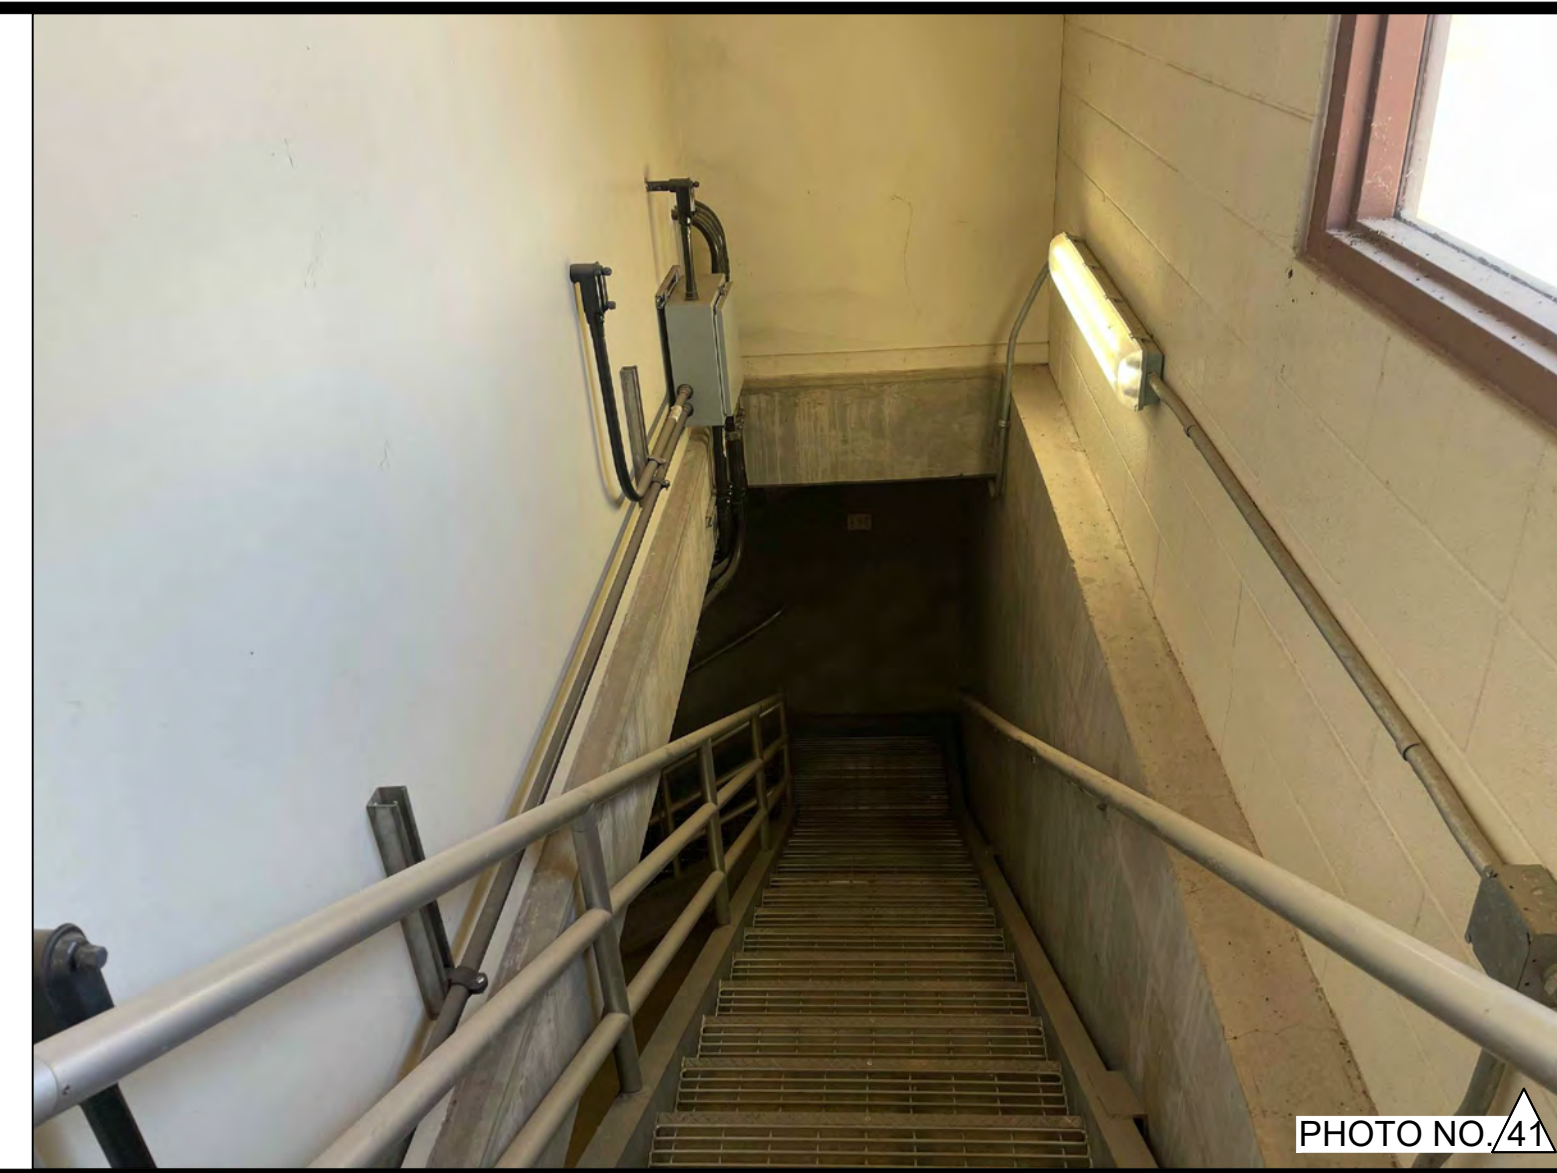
PHOTO OF THE STAIRS OF EXISTING SLUDGE PUMP STATION UPPER FLOOR
